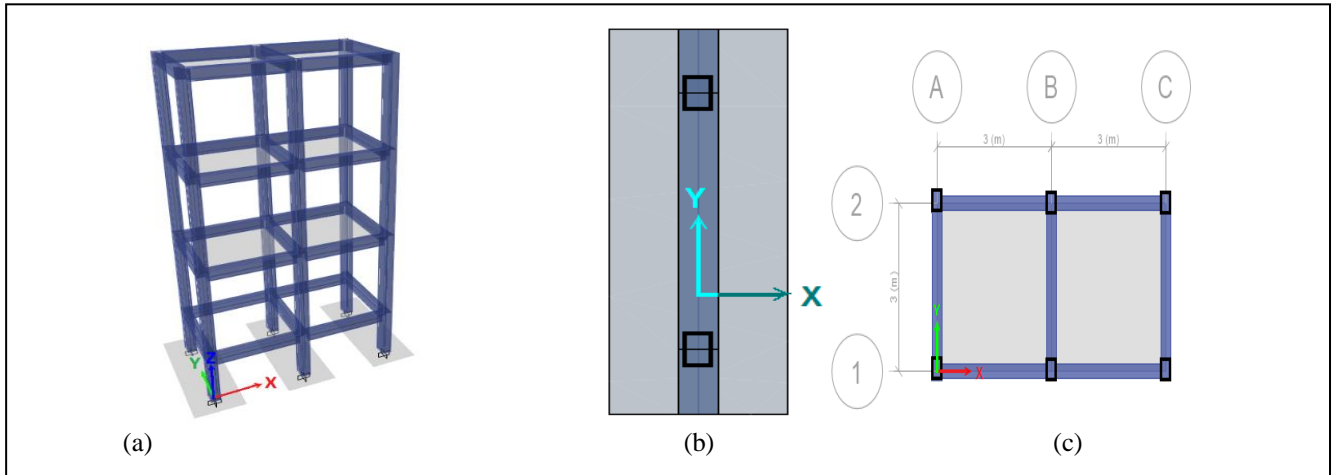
(a) The ETABS model, (b) plan view with dimensions and grid designations, and (c) the plan view of footing provided for the B frame
